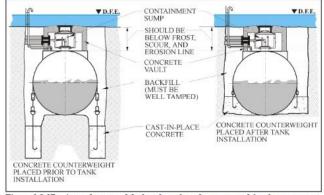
D: An underground fuel tank anchored onto poured-in-place concrete counterweights
